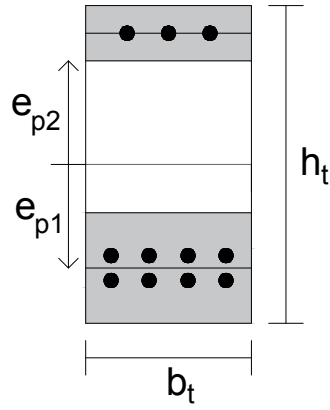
Prestress configuration in the open truss element in y-direction
